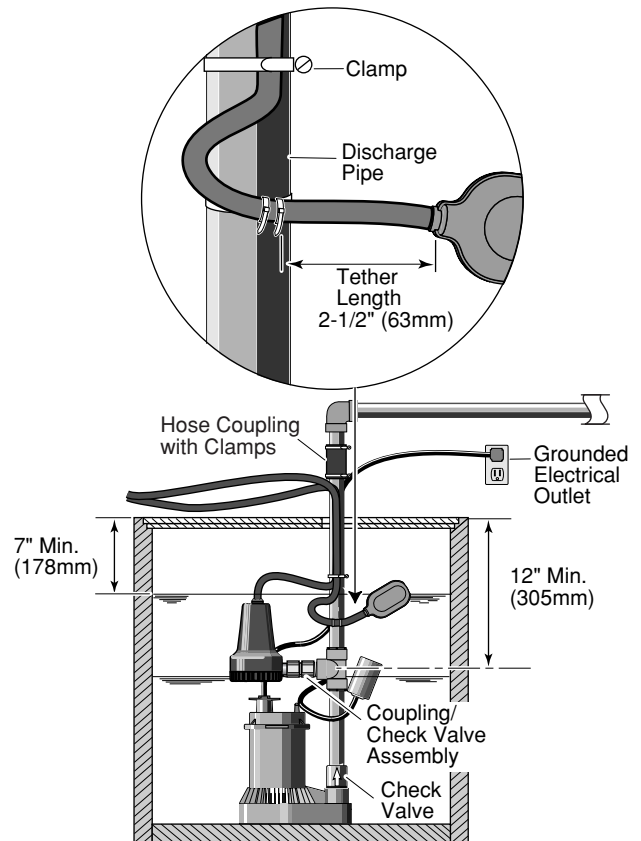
Method B – Make the second cut for installation of the backup pump and check valve assembly. Install the backup pump. Your installation may not require the reducer bushings.
